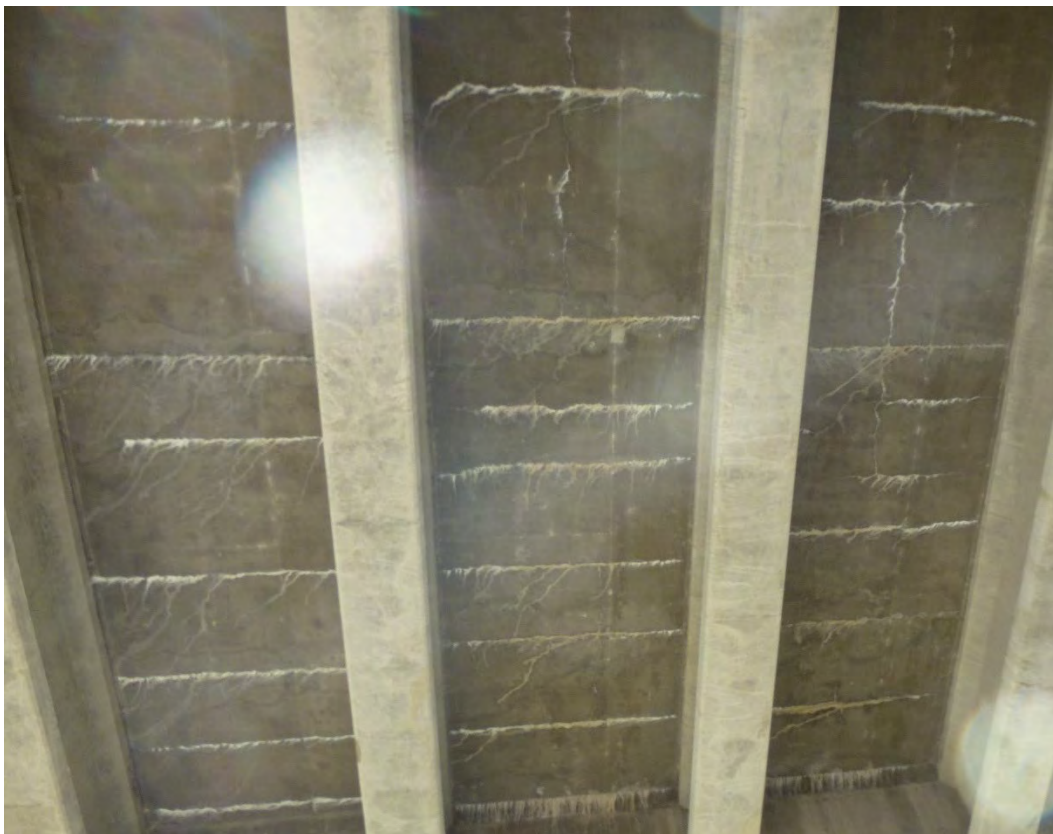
Example of Condition State 3. Tight spacing, jump cracks, some light staining from leakage, and some gray efflorescence.
